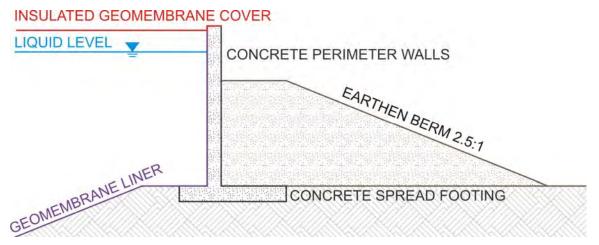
Cross-section showing the general layout for the concrete spread footings, concrete perimeter walls, and earthen berms for the low-rate anaerobic digester proposed for the Lake Utopia Paper Mill in Utopia, New Brunswick.
